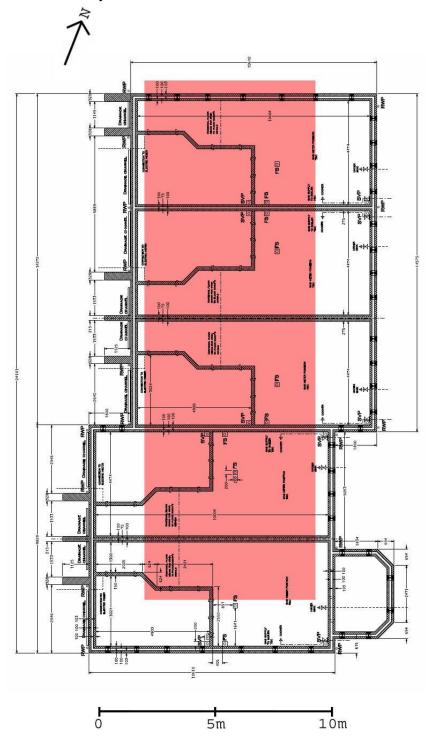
Foundation plan, showing the foundation trenches to be monitored. The area highlighted in red is that shown in fig. 20.
